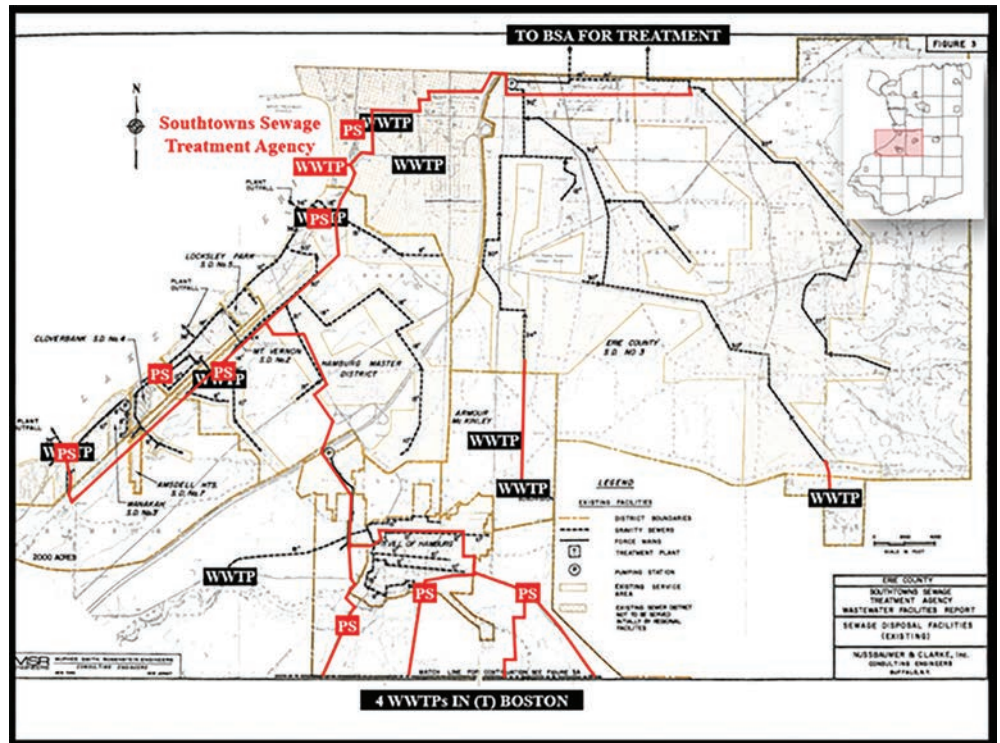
Infrastructure proposed in the 1975 “Wastewater Facilities Report” (in red) to eliminate flow to an overloaded Buffalo Sewer Authority system and eliminate numerous local wastewater treatment plants. Erie County
